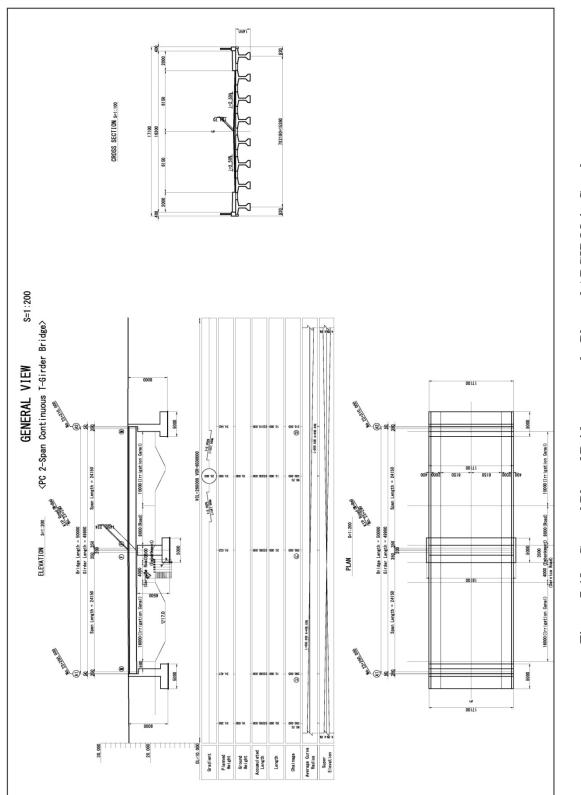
General Plan of Bridge across the Planned APGIP Main Canal
